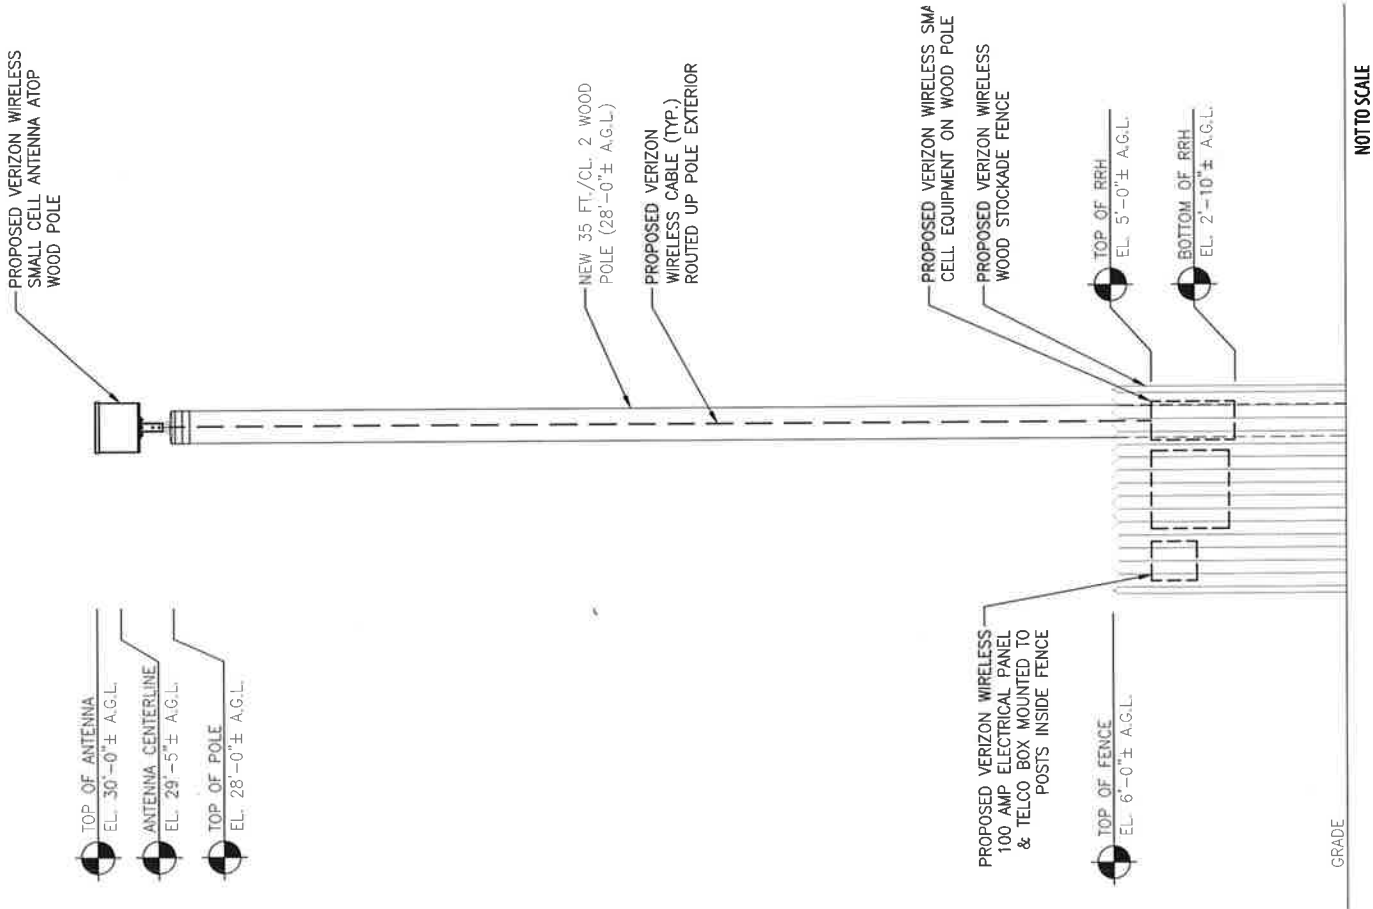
PROPOSED EQUIPMENT LOCATION AND ELEVATION PLAN FOR ANTENNA SC-2 CT
